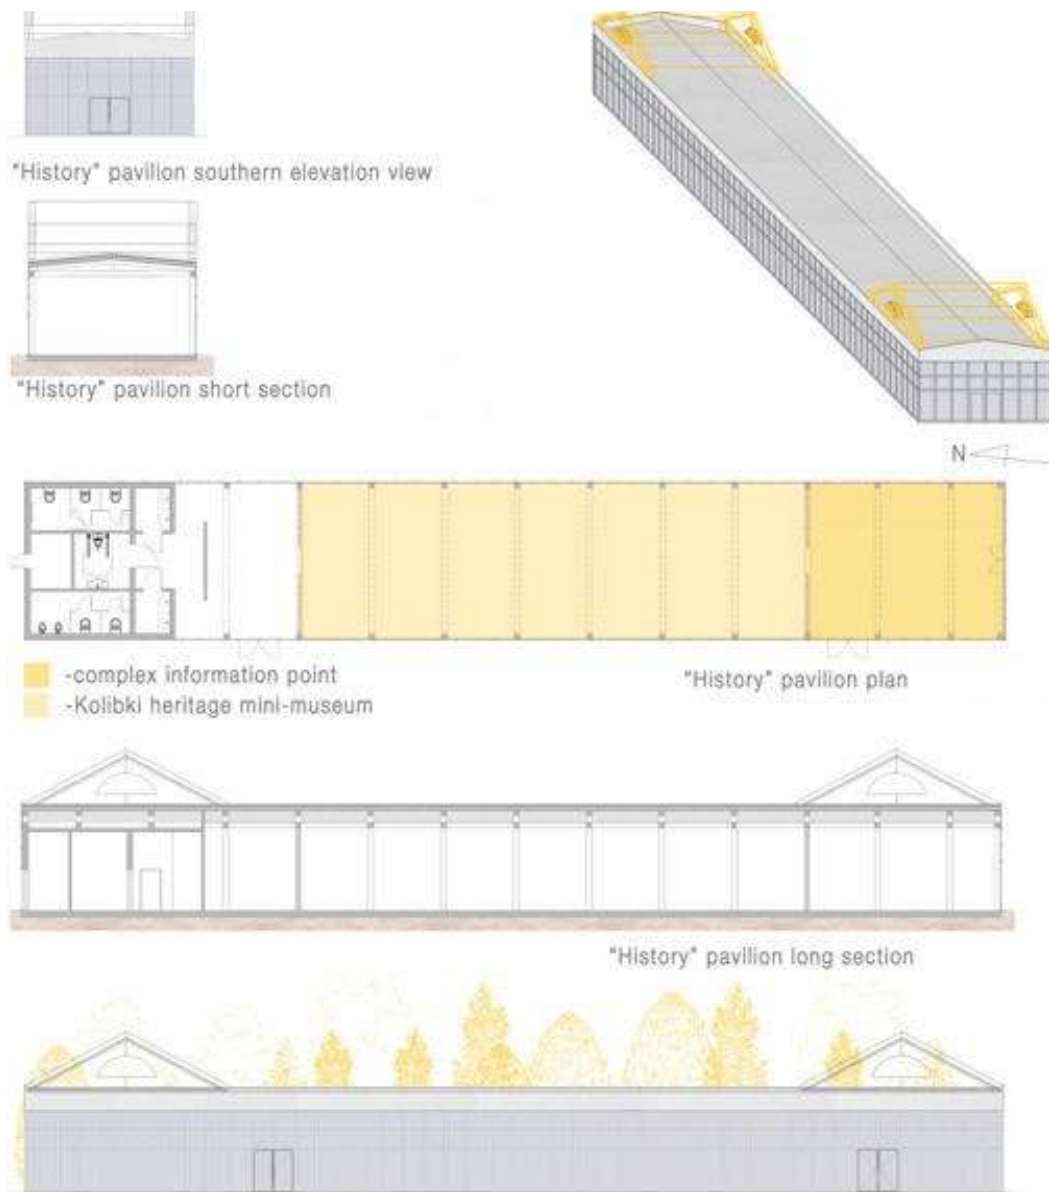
"History" pavilion (variant 2) design concept materials including general plan, front view, detail view and section and historic elevation of the non-existing farmhouse
